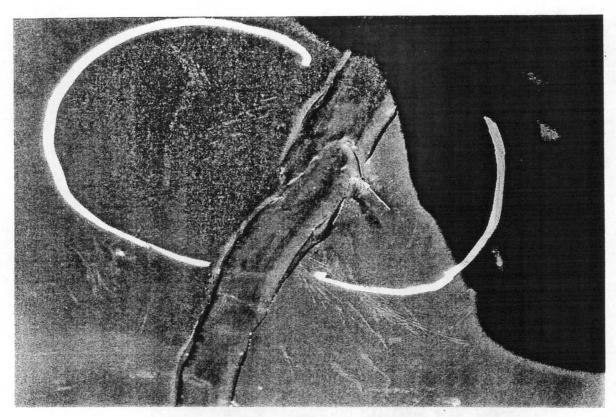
Crack (arrowed) at extrusion bead repair stop/start on west slope. Location 10.
